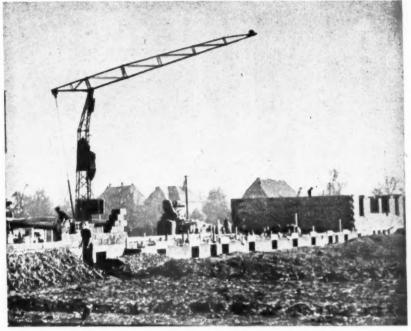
, small German tower crane, used for house-building, with a capacity of 11 cwt at 40-ft reach. Electrically driven.
